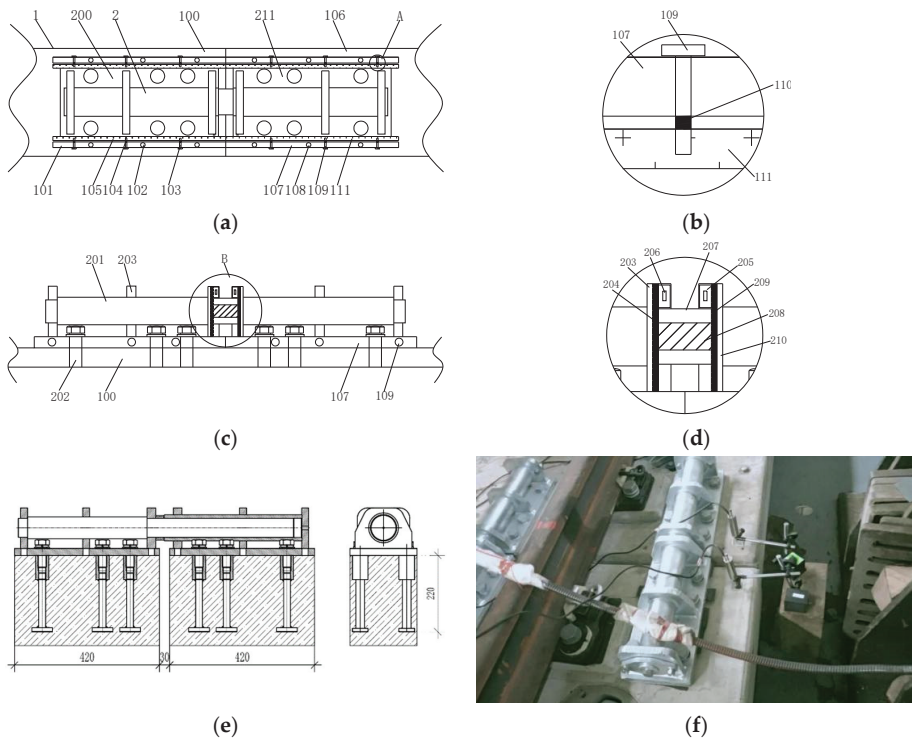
Floating slab track combined shear hinge structure design and physical site drawing. (a) Top view schematic. (b) The enlarged schematic diagram at A. (c) Side view schematic. (d) The enlarged schematic diagram at B. (e) Design drawing of shear hinge structure. (f) On-site installation of shear hinge.
